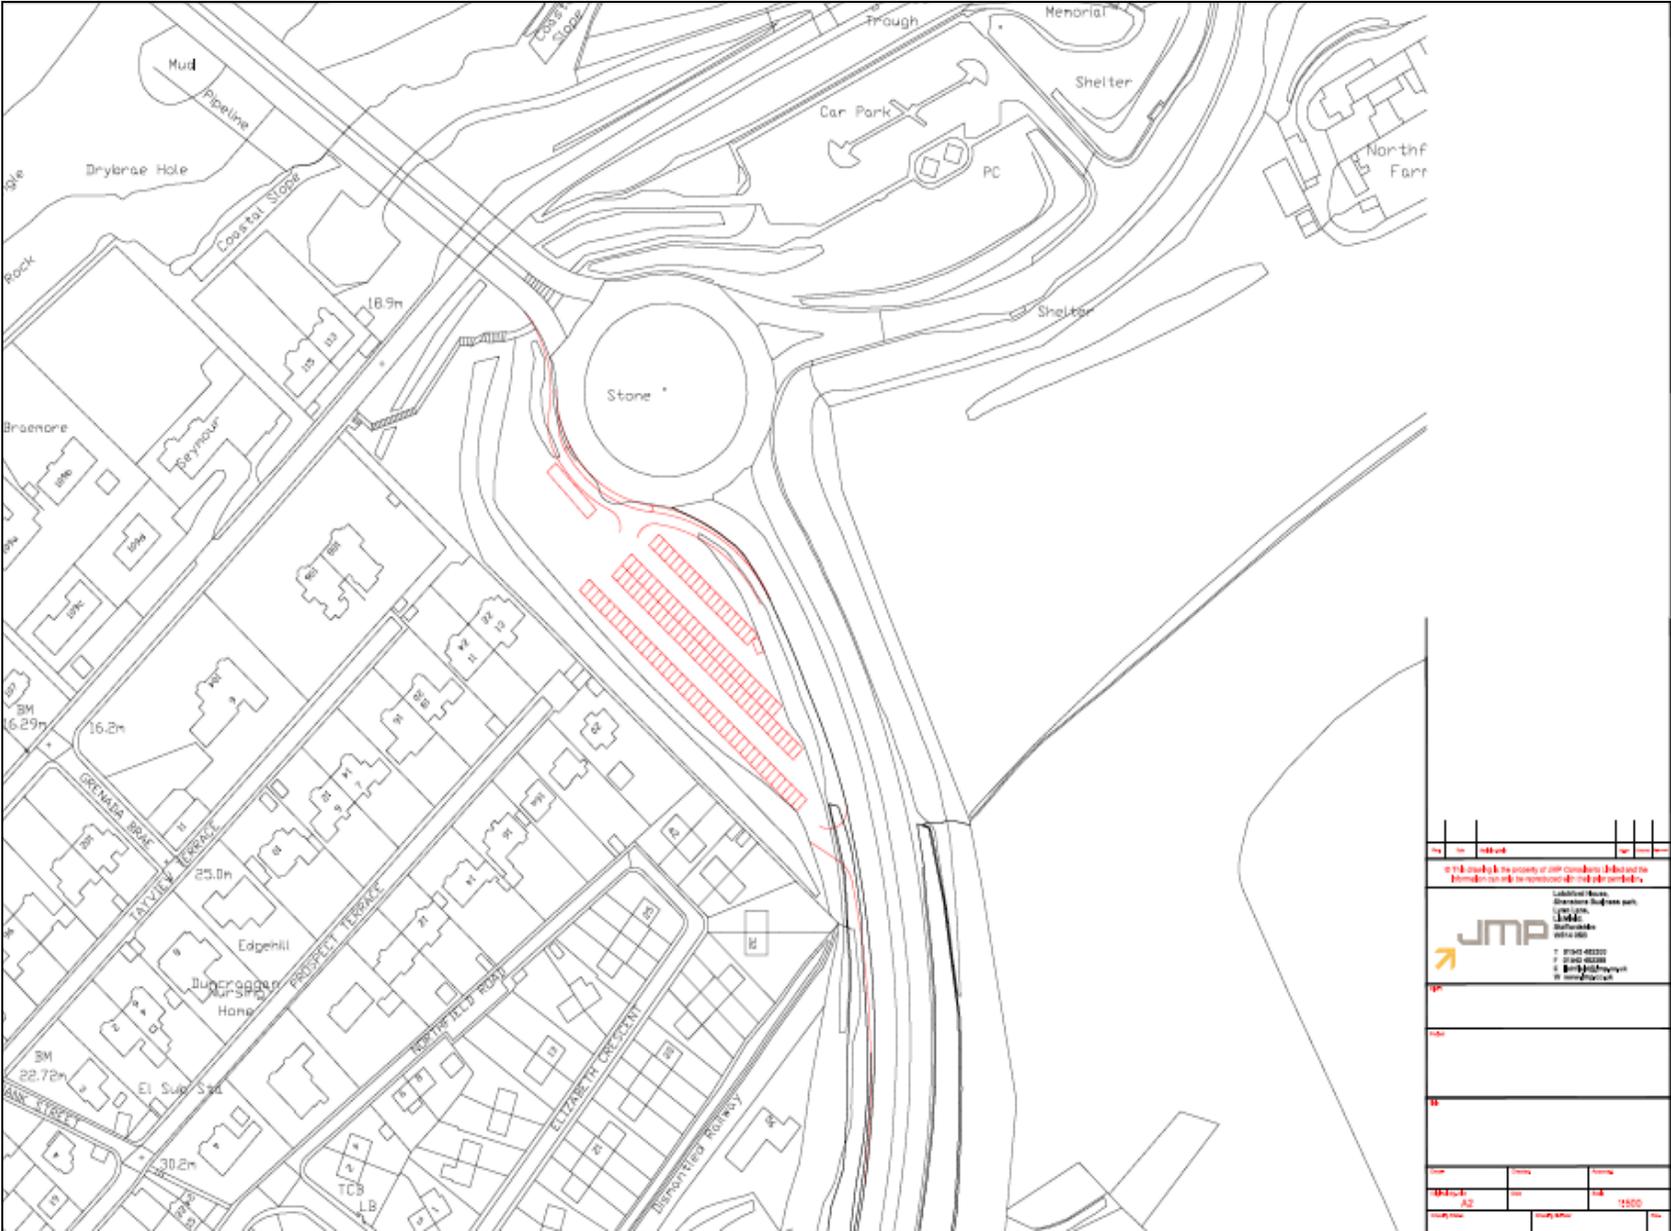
Outline Design – Forgan Roundabout/A92 P+R site with new roundabout access
